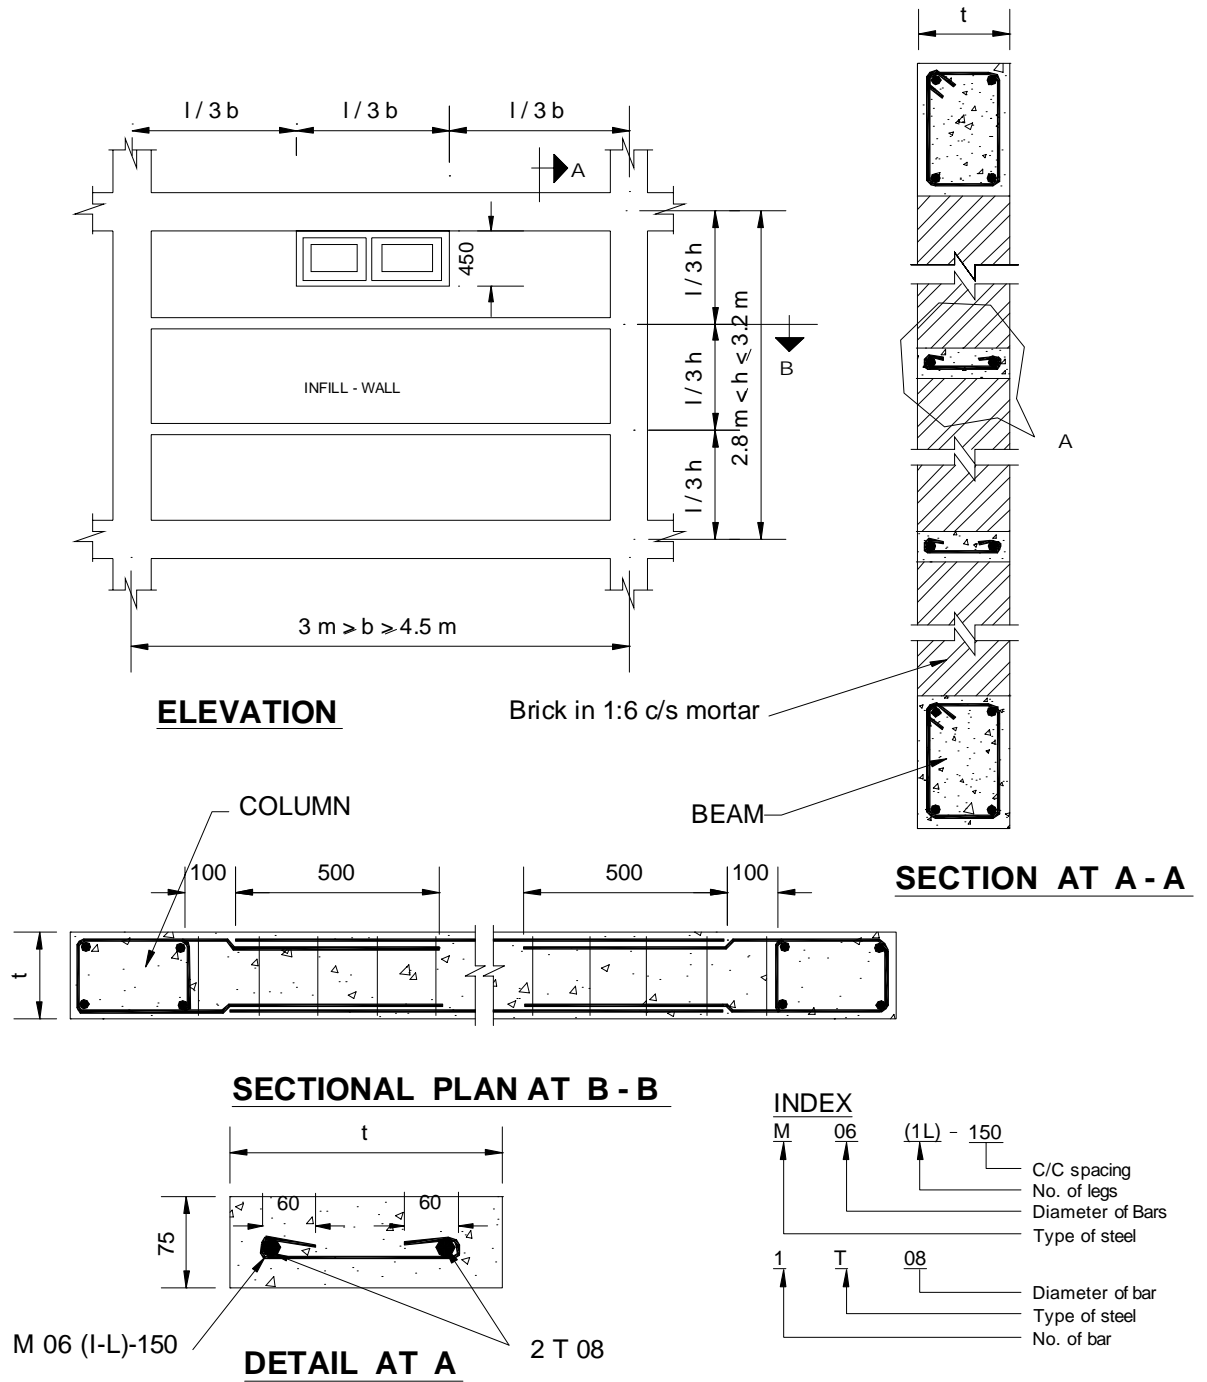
Tie-Band Detail for Infill (Structural) Walls
